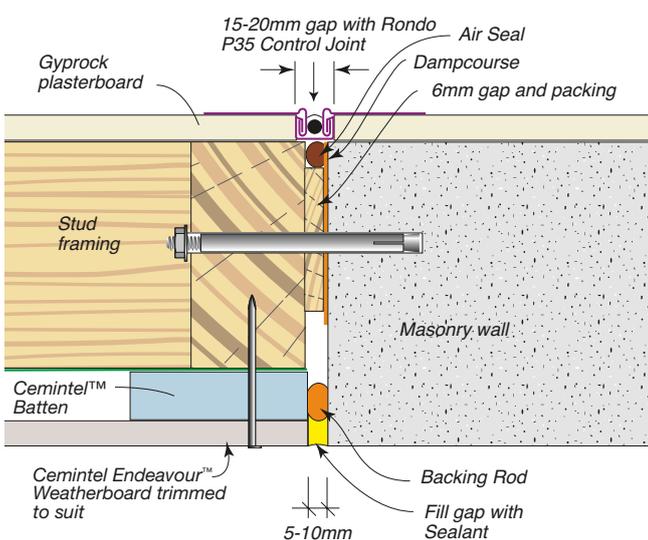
Second Storey Junction with Hebel Panels, Brick Veneer or Masonry Wall – Cantilevered Framing
